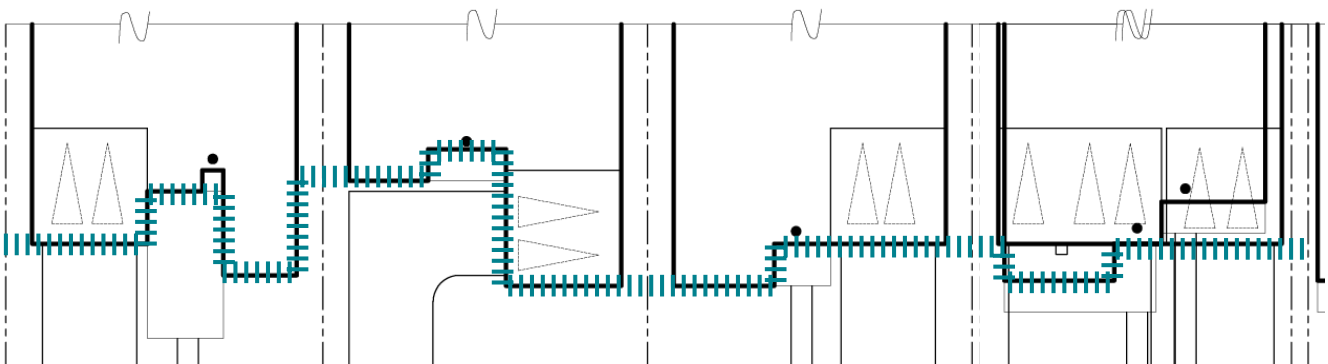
Example of Staggered Front Yards and Varied Garage Configurations/Locations
